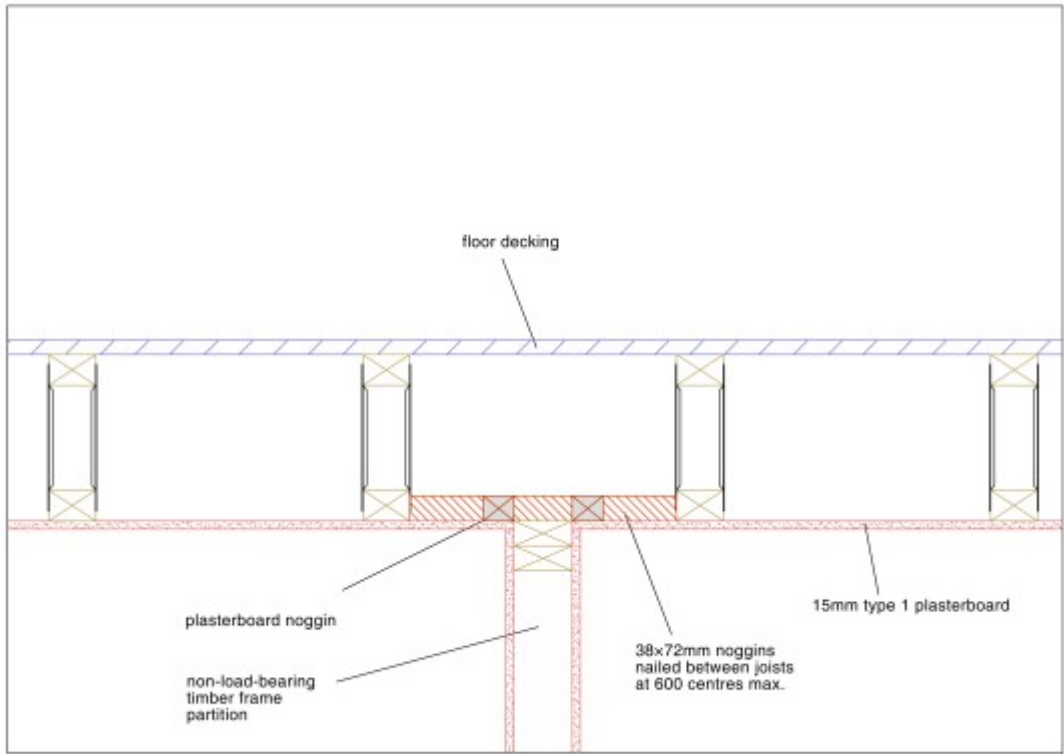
Cross section; non-load bearing timber frame wall parallel to joists; 30 minutes fire resistance; joist centres > 400mm
